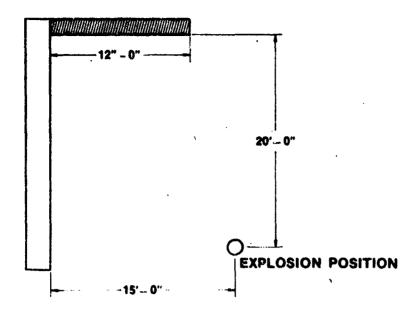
Wall and explosive position input into CBARCS for existing control-room wall.
